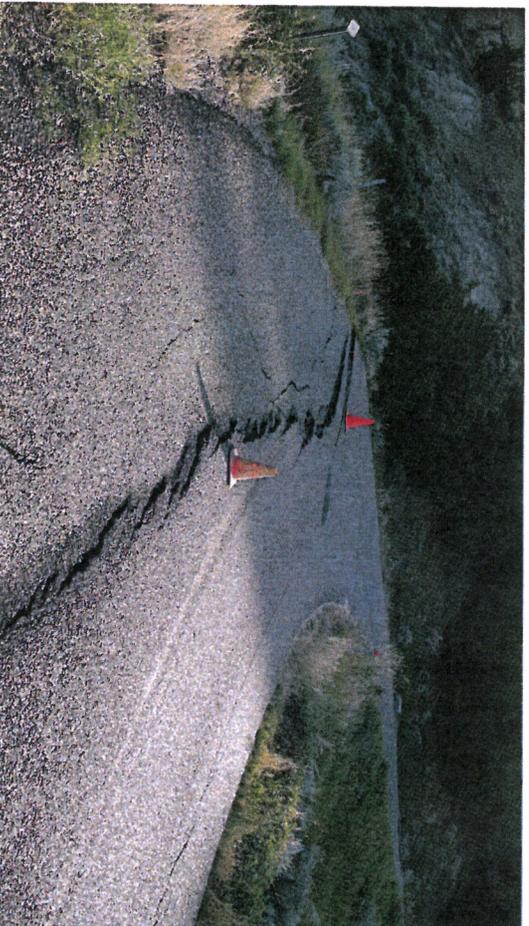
Surficial cracking and evidence of sub-base failure. (Photo courtesy of MT FWP).
